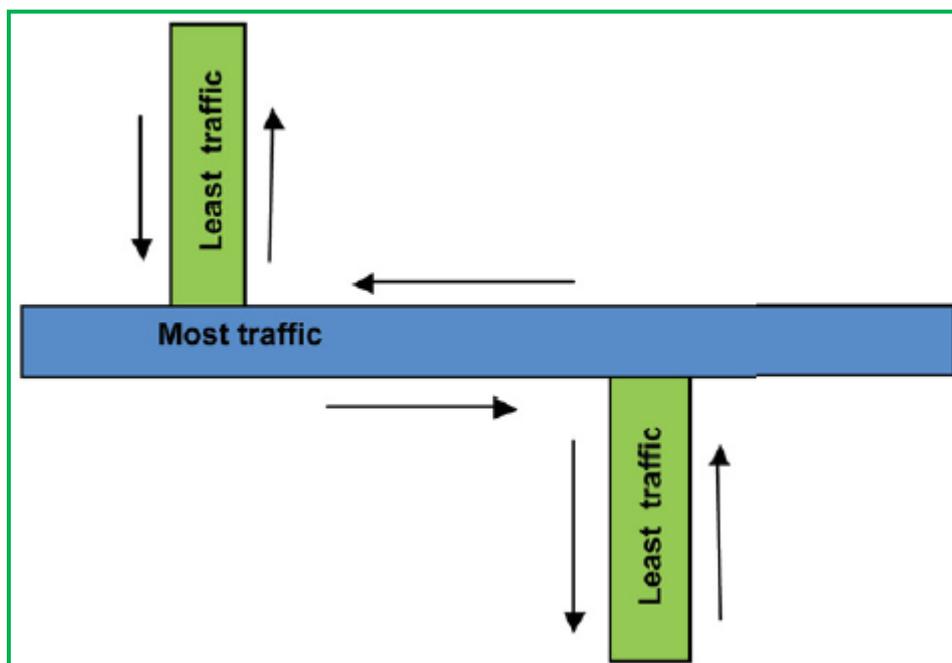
Preferred intersection design (for driving on the right hand side of carriageway)
